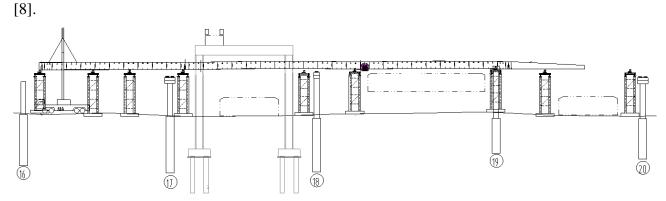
Top push construction layout drawingFrom the perspective of safe construction, site restrictions and economic feasibility, 3 temporary assembled piers are set up between piers 16 and 17 piers. A single steel box girder is hoisted 4 times and pushed up 4 times, namely 4, 3, 6 and 6 pieces respectively. There are 6 top push temporary piers between the 17th and 20th piers, with a maximum distance of 35m. They are the viaduct section of Chen Tuo Road on the upper span expressway. The steel guide beam has a maximum span of 60% and 21m. Considering that the weight of a single steel box girder is 767.9t and the weight of the steel guide beam is 22.5t, and the7 temporary piers are pushed up at the same time when bearing the maximum weight, two step-by jacks rated 650t are set up on the top of each temporary pier, which can theoretically meet the top push requirements of the steel box girder.
